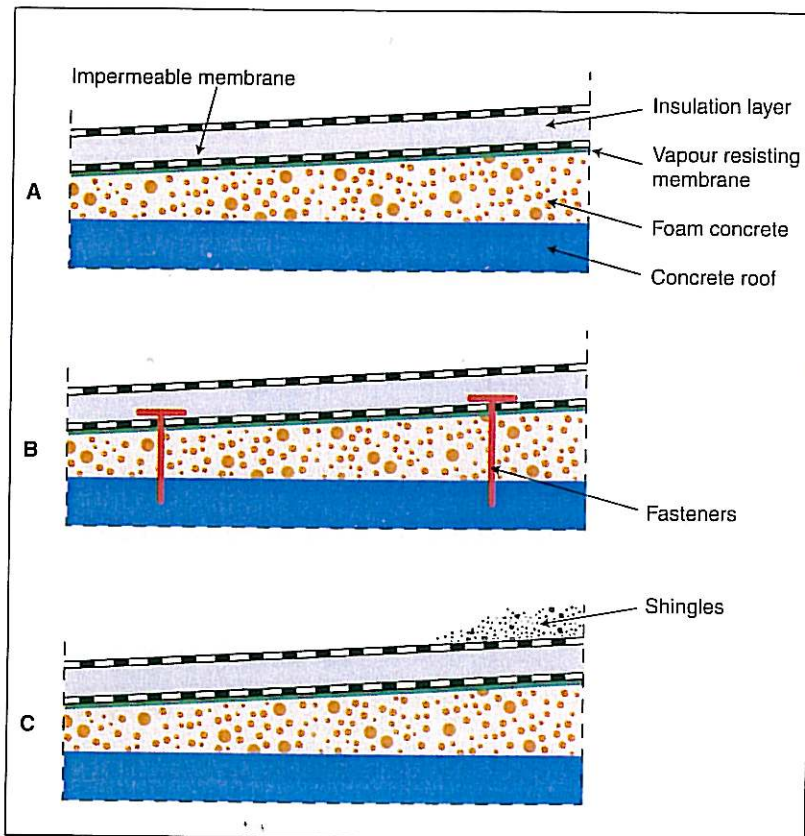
Cross-sections of three roof construction techniques using foam concrete.
